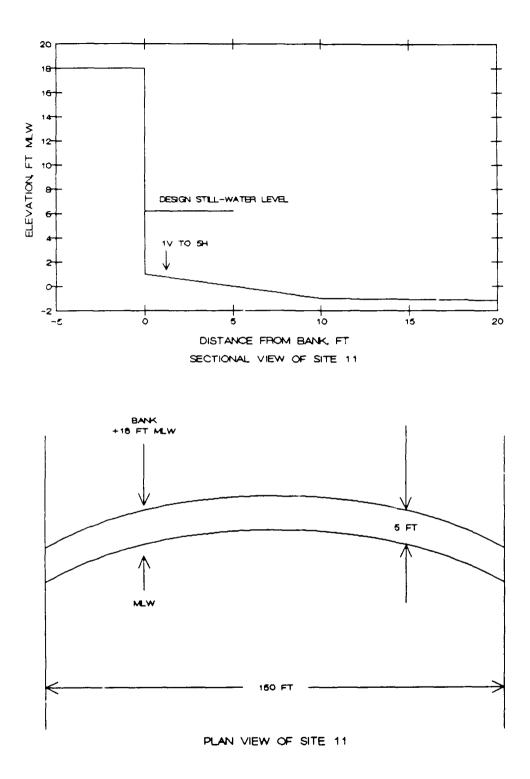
SECTIONAL AND PLAN VIEWS OF SITE 11
